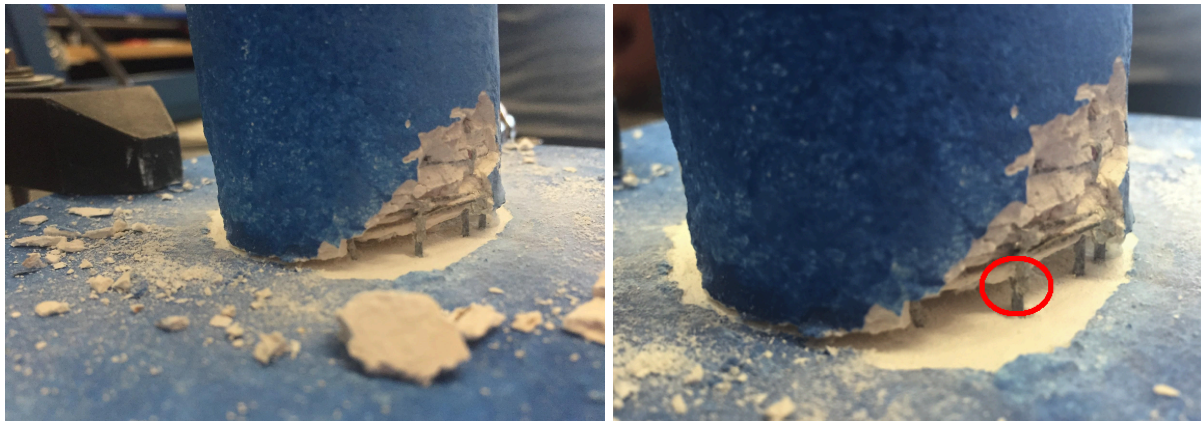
Column testing results, exposed rebar and necking shown in longitudinal rebar
